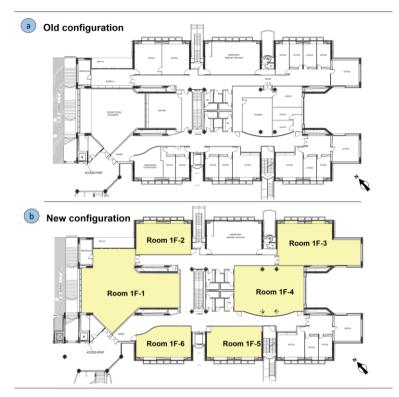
1st floor of the block II: Current plan (A) and architectural renovation (B) designed for having 7 new classrooms (1 at the ground floor, 6 at the first floor)
